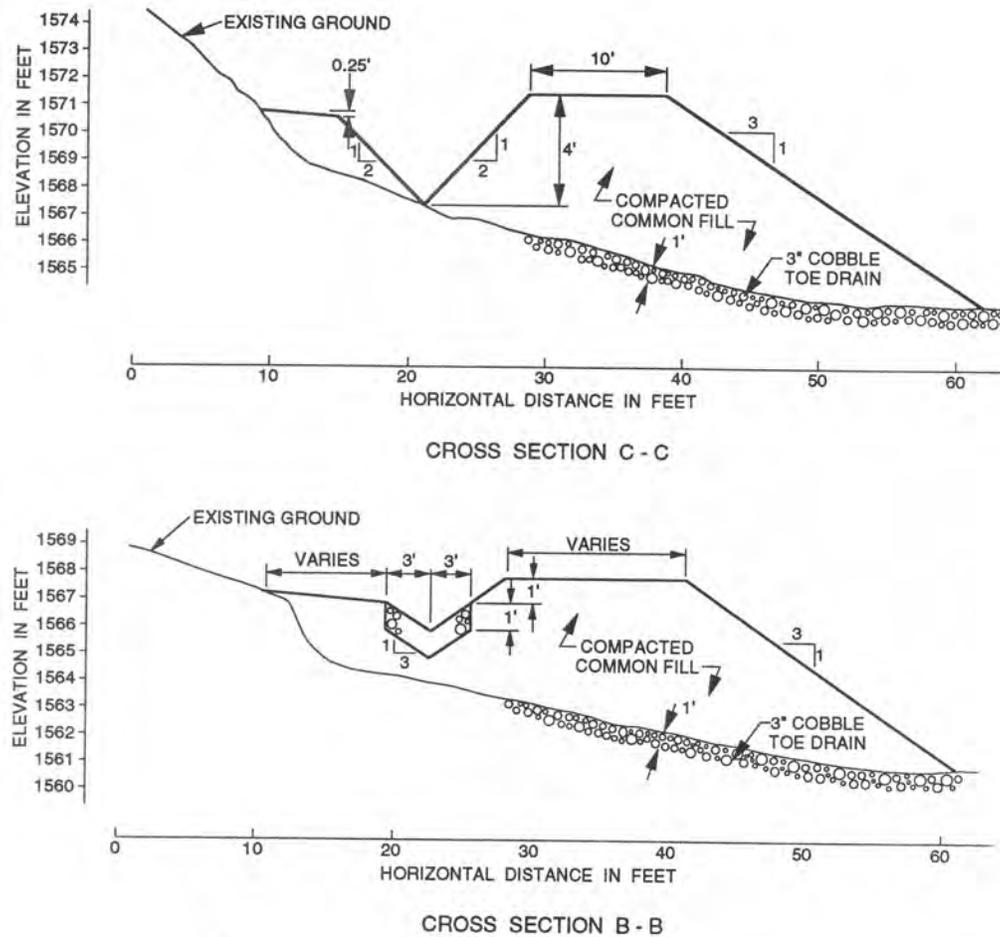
The fishway is built on new material added to the existing dam with a toe drain that joins with the original toe drain (drawing Ewashko Consulting).
